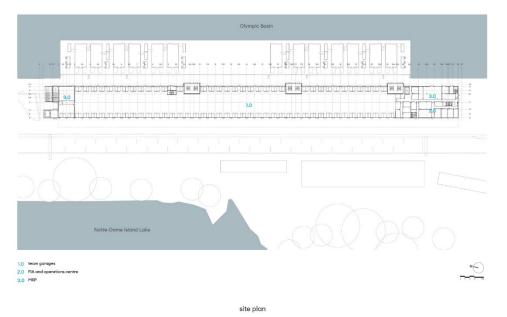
Ground Floor Plan of Canadian Grand Prix Paddock (Source: FABG Architectes)
